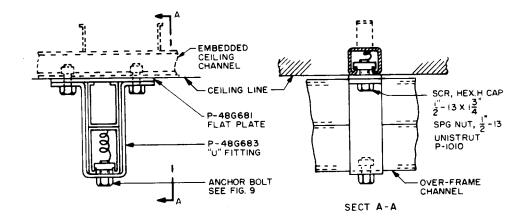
Fastening Overframe Channel—Directly to Embedded Ceiling Channel —Single Lineup—1200- to 1400-Pound Bays (A&M Only)
